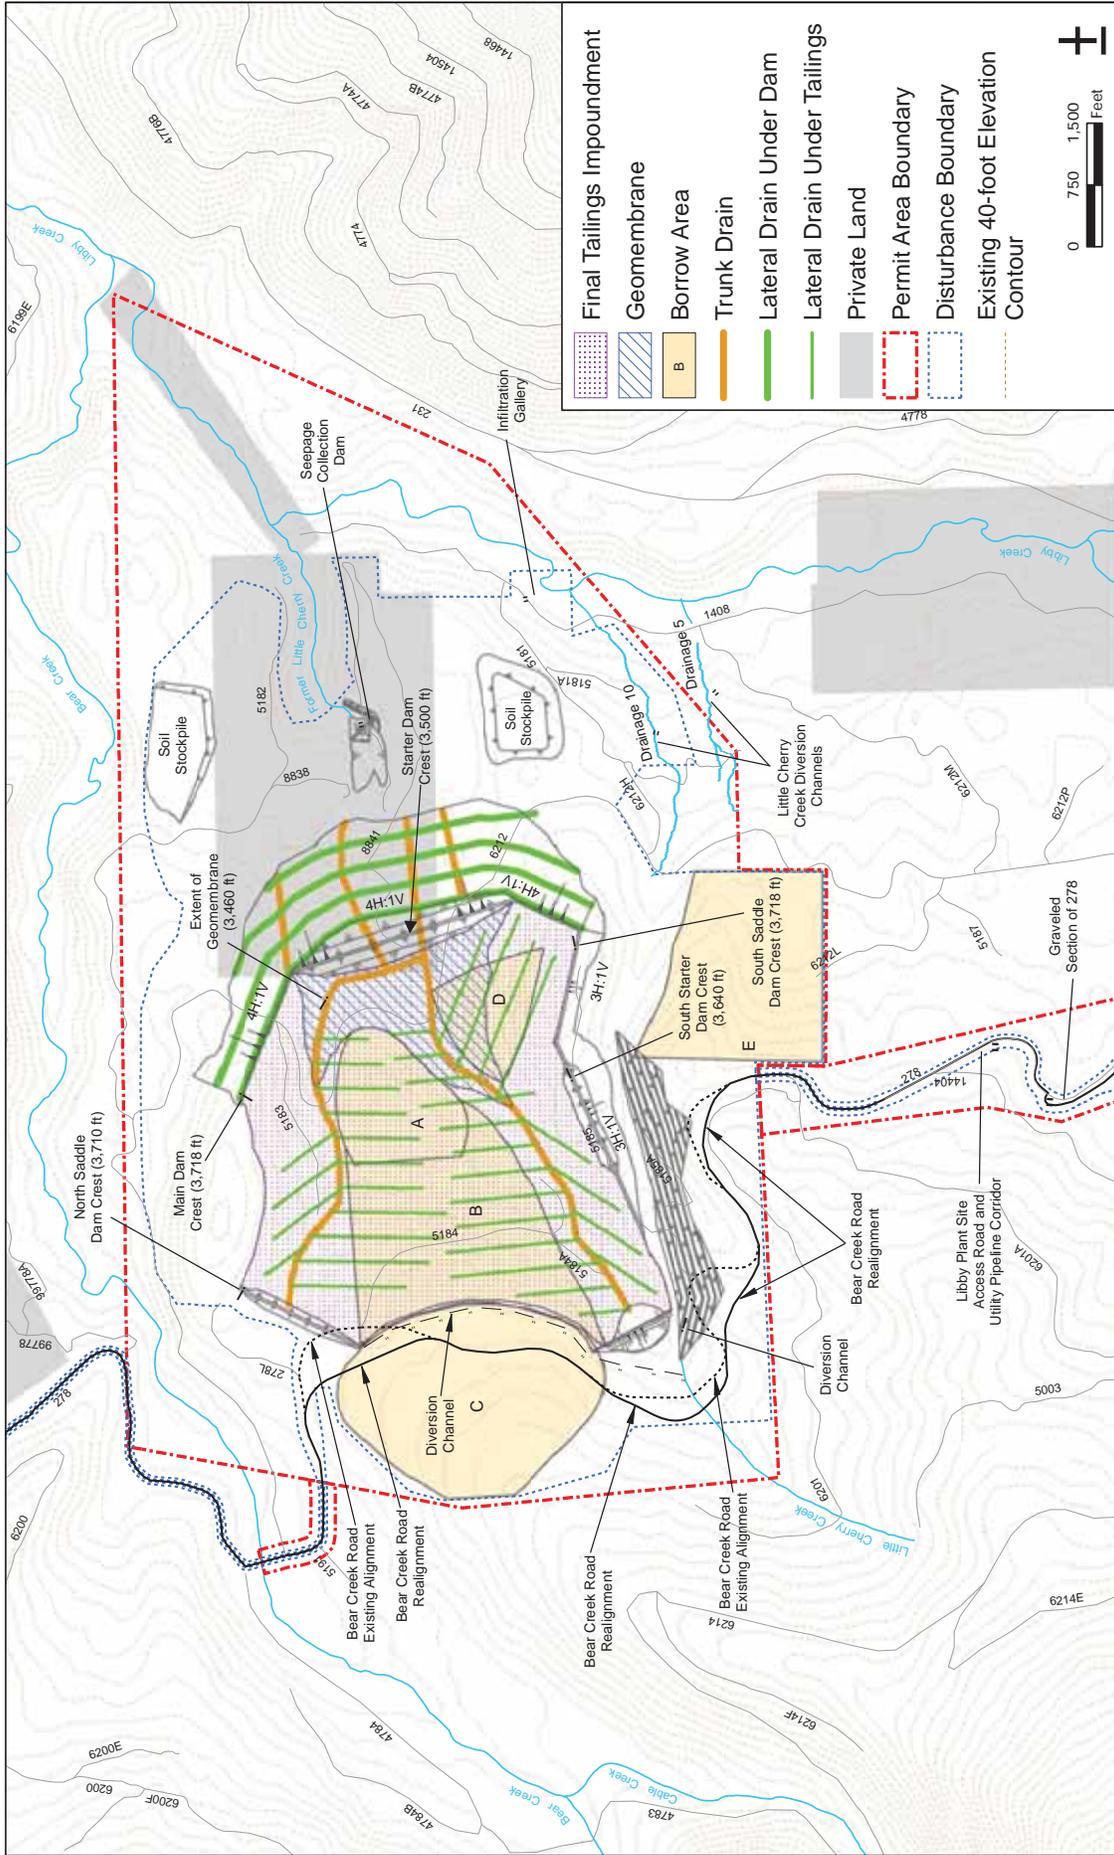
Little Cherry Creek Tailings Impoundment Site, Alternative 4
